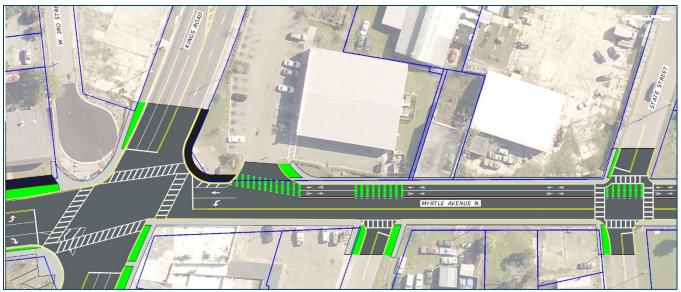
Detail of Parcel Lines from State Street to Kings Road
